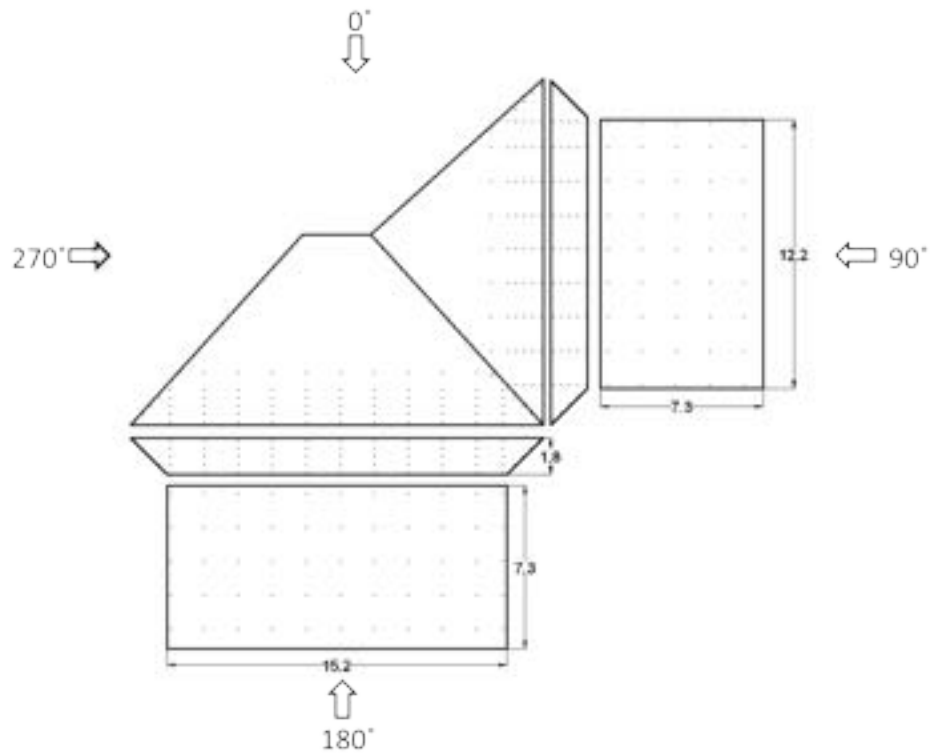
14: Pressure taps layout on walls, soffits, and roof with overhangs of 1.8 m (m) – Model F
